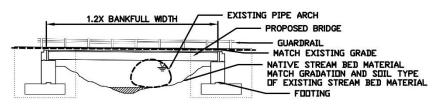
Typical detail of a replacement bridge designed to meet the MA River and Stream Crossing Standards
